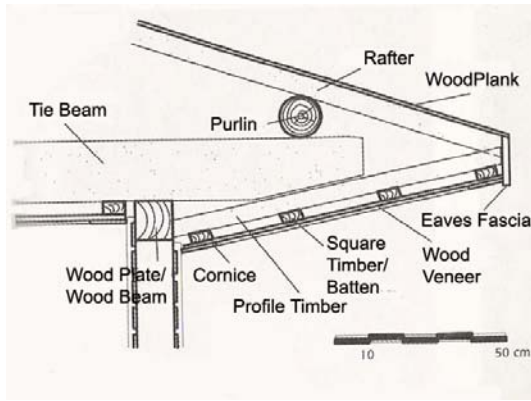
Detail of roof system of a house in Birgi (Source: Ekinçi 2005)
